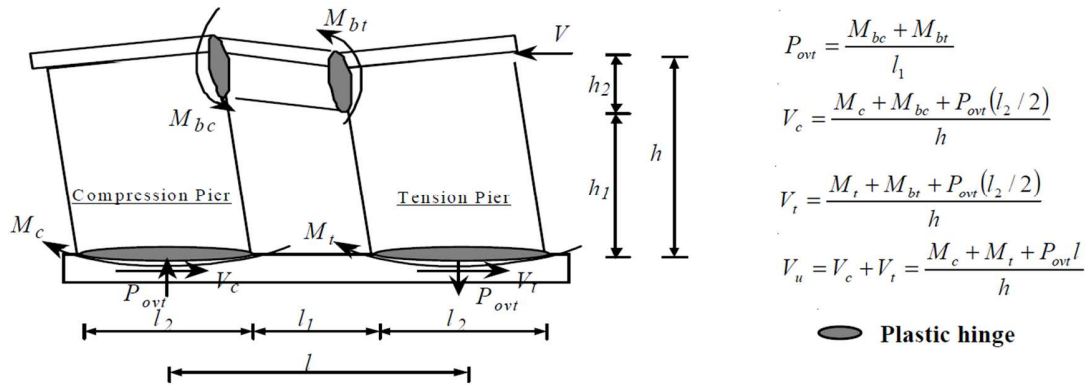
Strong Pier/Weak Spandrel Failure Mechanism Elshafie[32]
